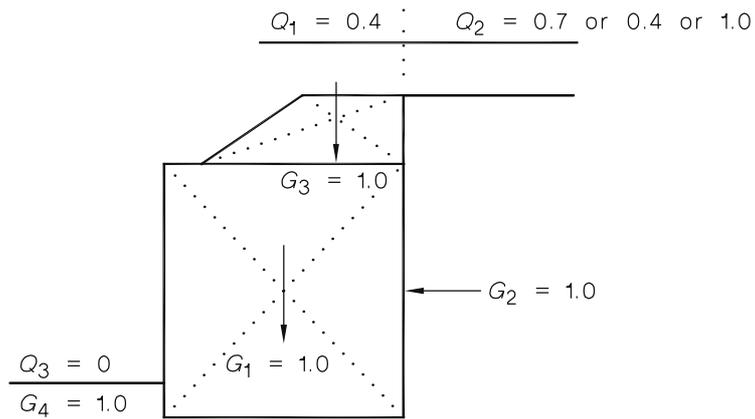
EFFECTIVE EARTH-RETAINING STRUCTURES
